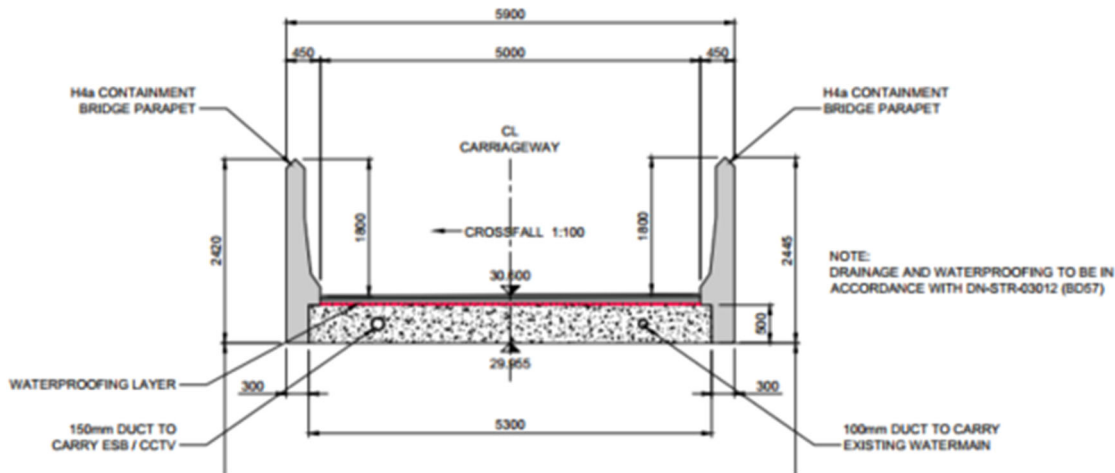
Glasnevin Cemetery Road Bridge (OBO10) Cross Section – Facing North
